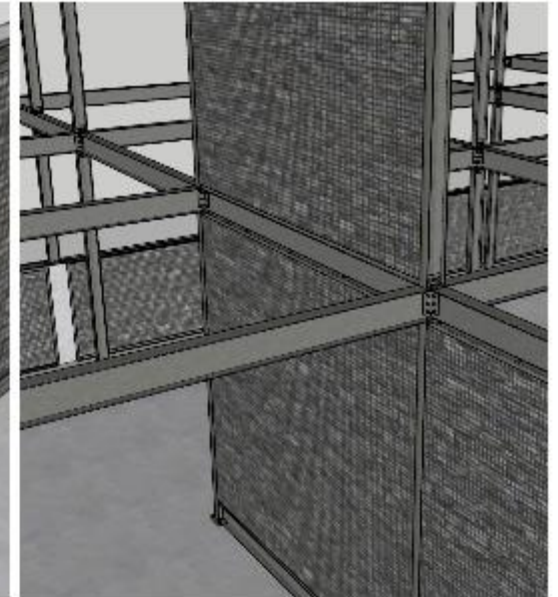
3D model of in-fill gabion walls used in conjunction with steel column and beam structure.
